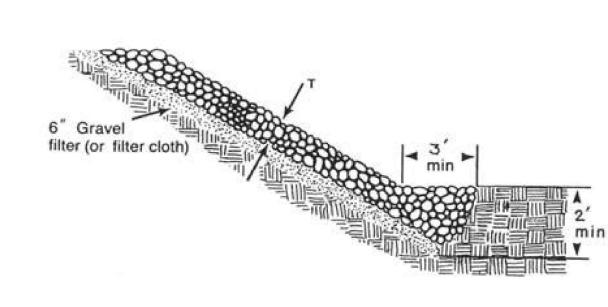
Typical Riprap Slope Protection Detail
